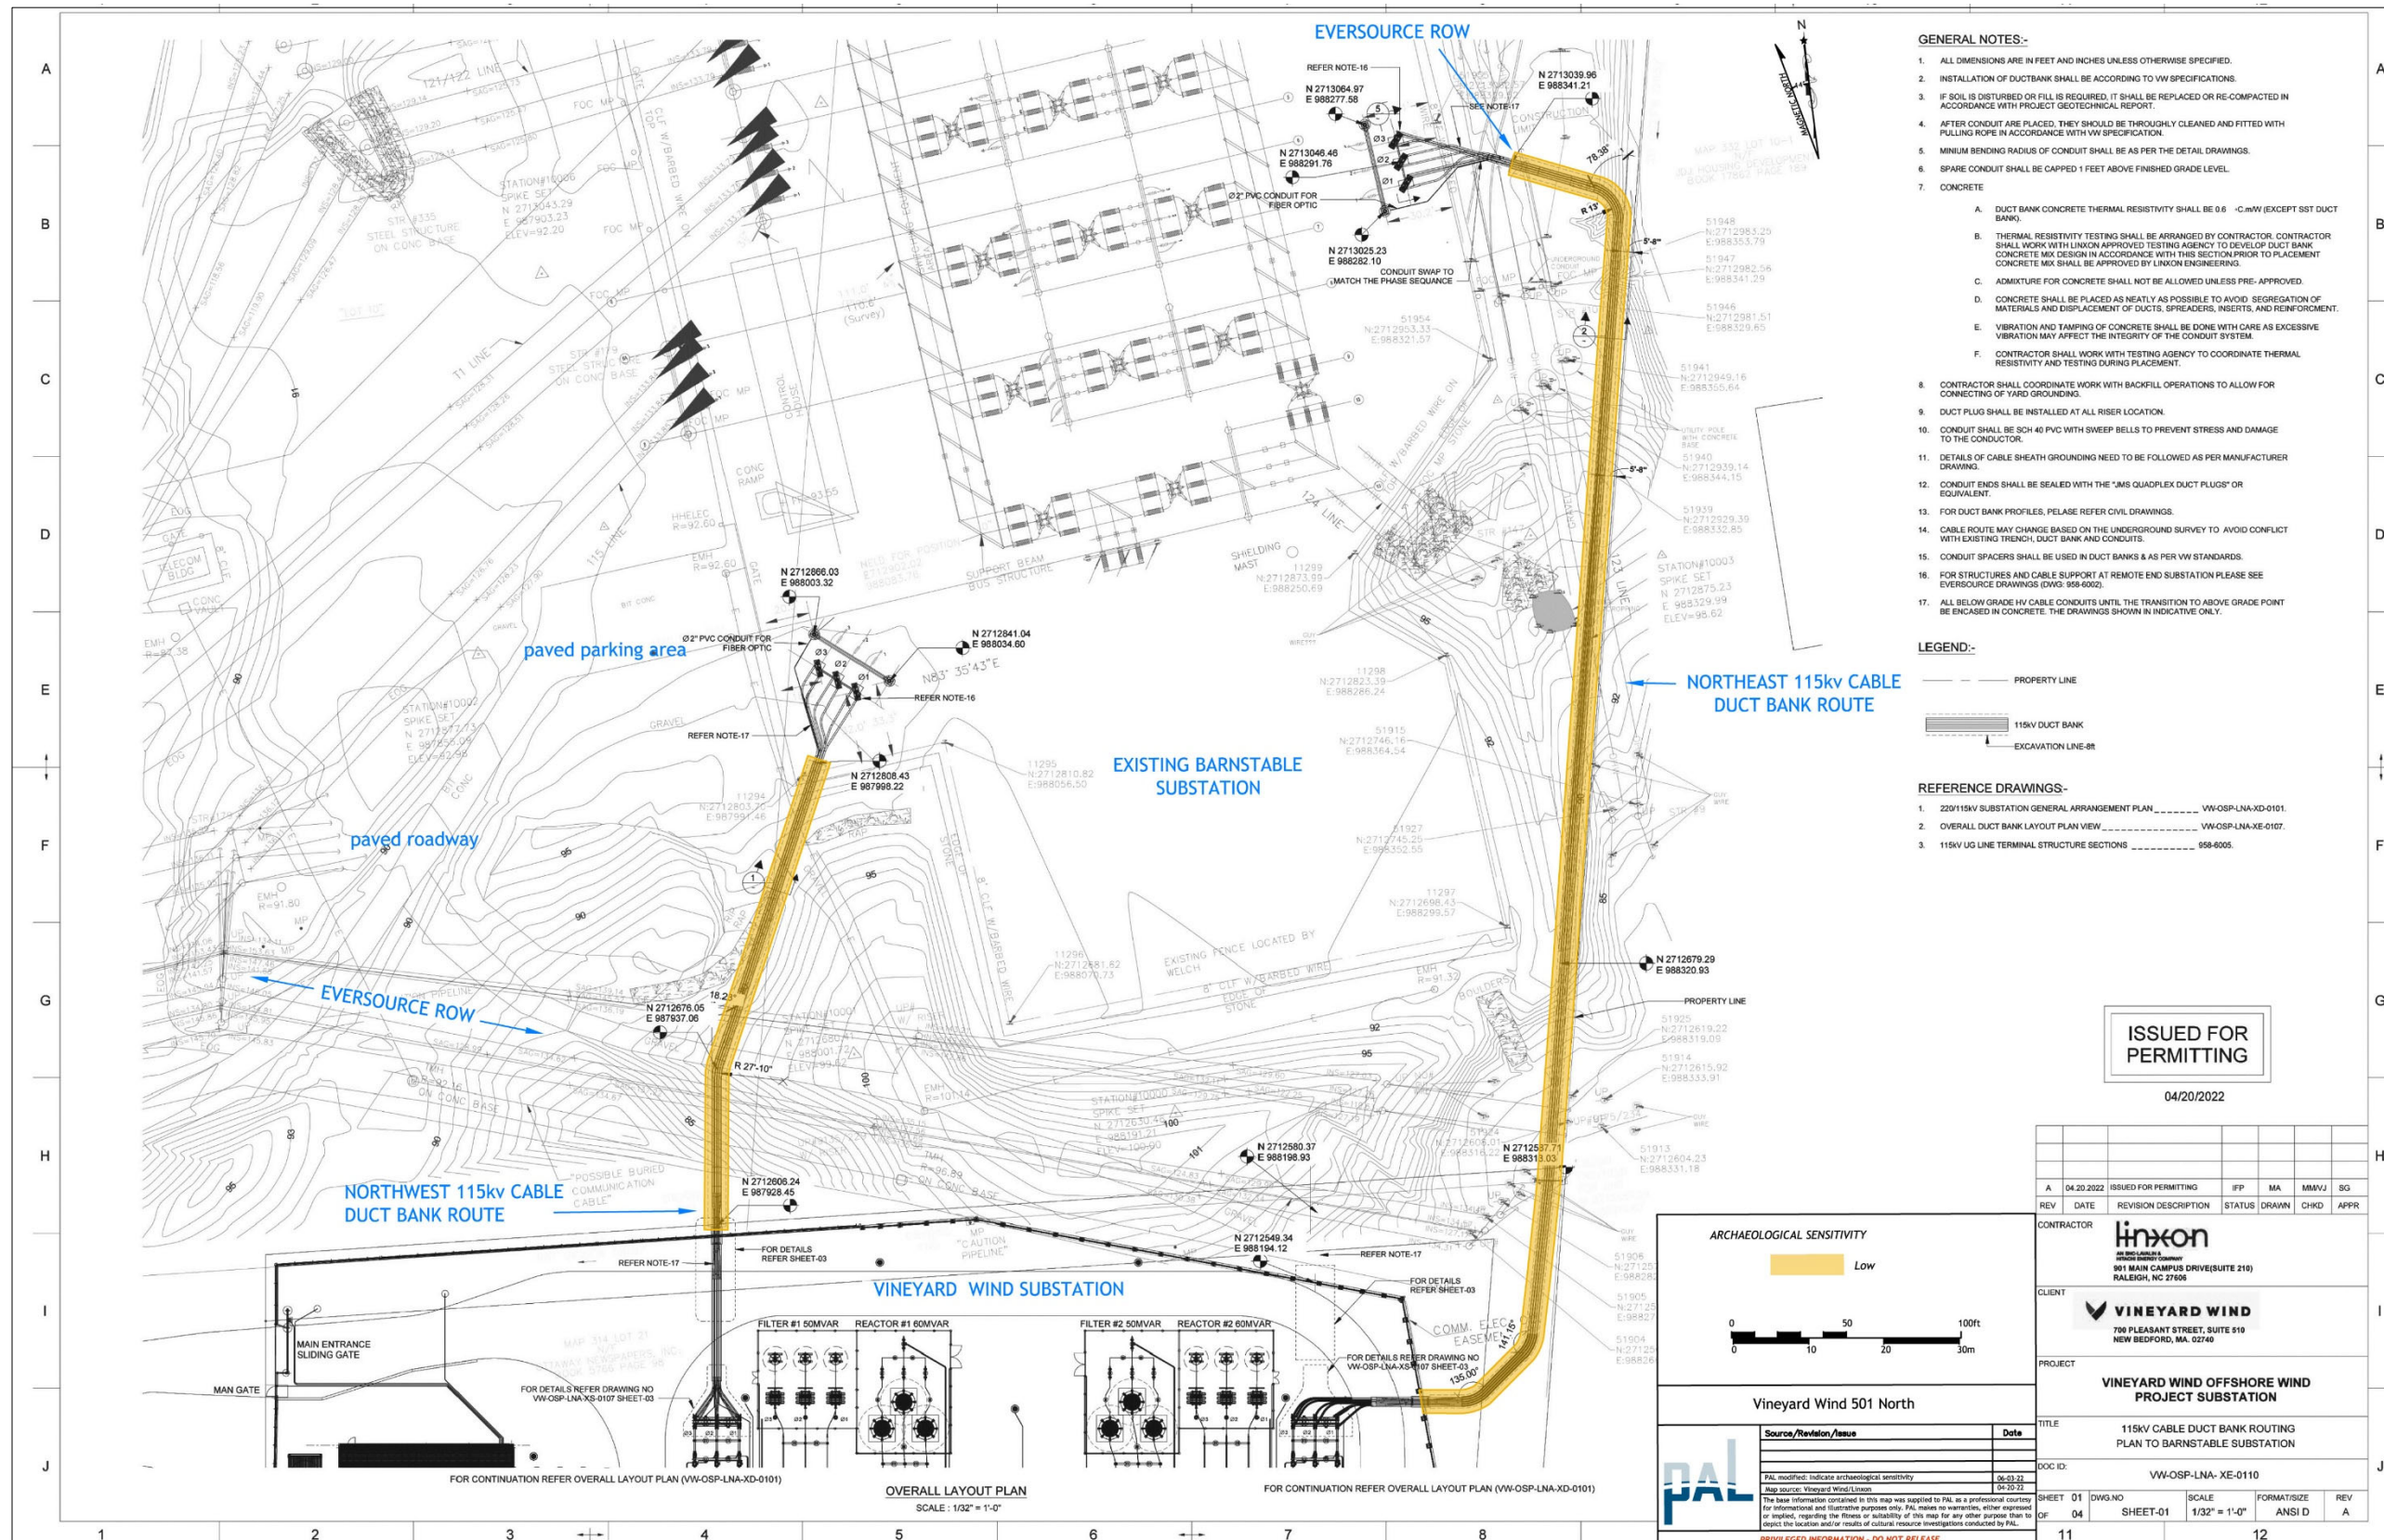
Proposed Northwest and Northeast 115kv Cable Duct Bank Routes from Vineyard Wind Substation to existing Barnstable Substation with archaeological sensitivity.
